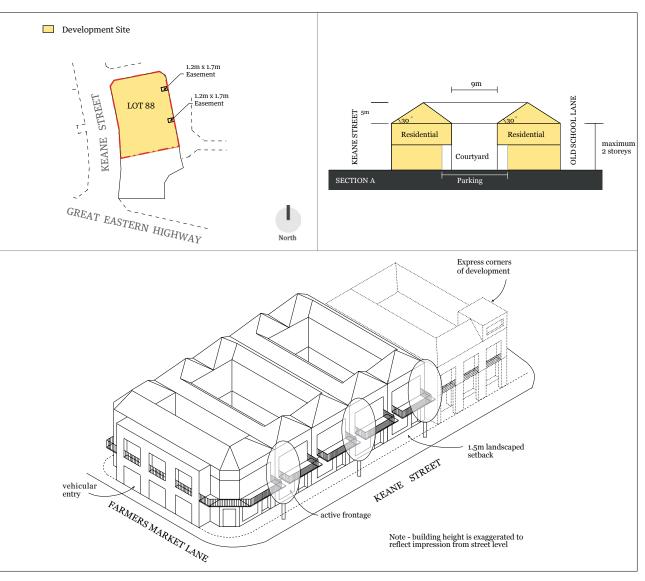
SITE H (NORTHERN LOT) SITE SPECIFIC DIAGRAM
